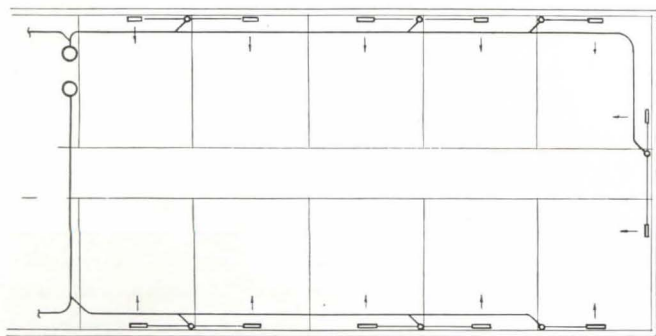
single-duct under-window installation: two zones fed from two risers distribute high-velocity air in perimeter areas through horizontal ducts beneath floor. Take-offs may feed one or two under-window units.
